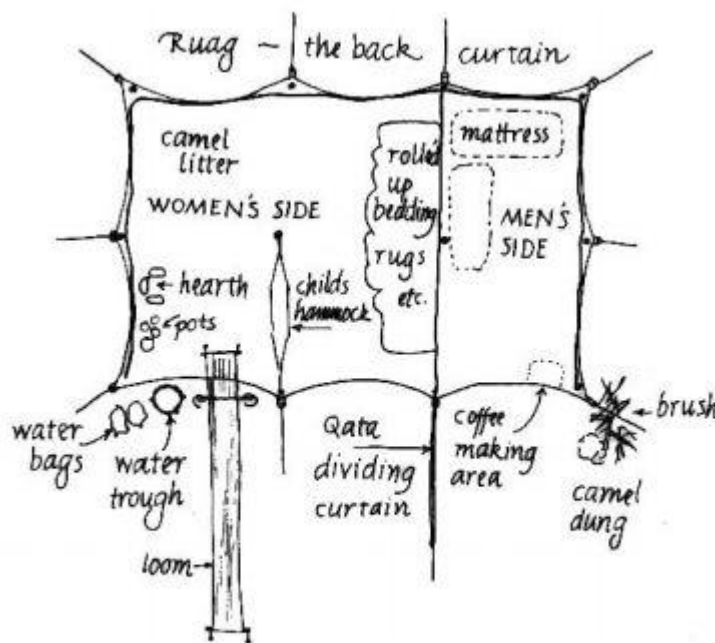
Plan (layout) of a Bedouin tent (Source: Cowan, 2002)
